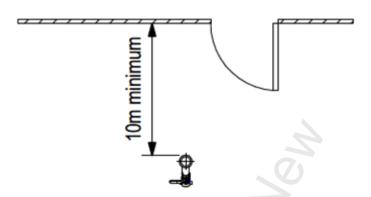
(d) – Non sprinklered building – Hydrant outlet protection Separation distance option – Plan view
